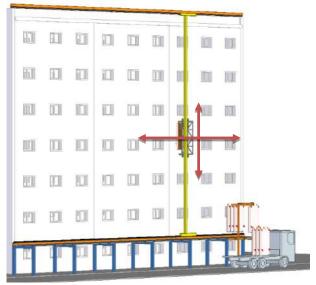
Installation process by a stacker crane (also known as vertical bridge crane).
